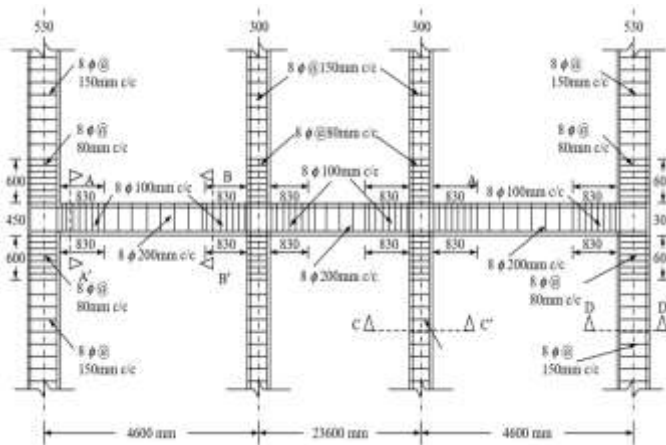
Detailing of reinforcement at a level 2 of sub frame 4-4 as per IS 13920:1993
